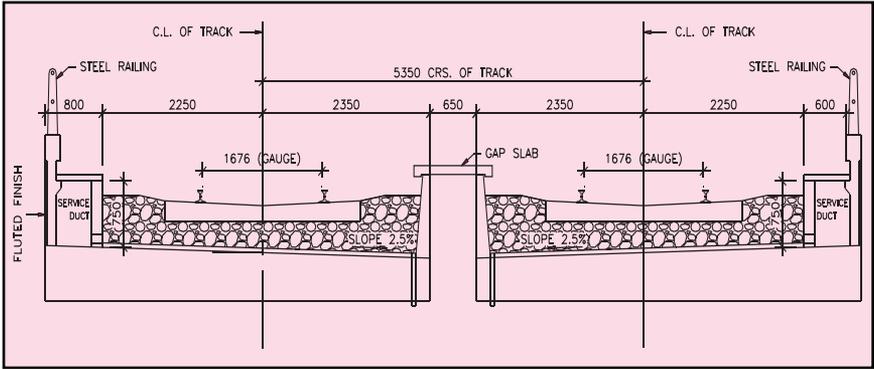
Typical Cross section of PSC slab spans 6m to 10m
